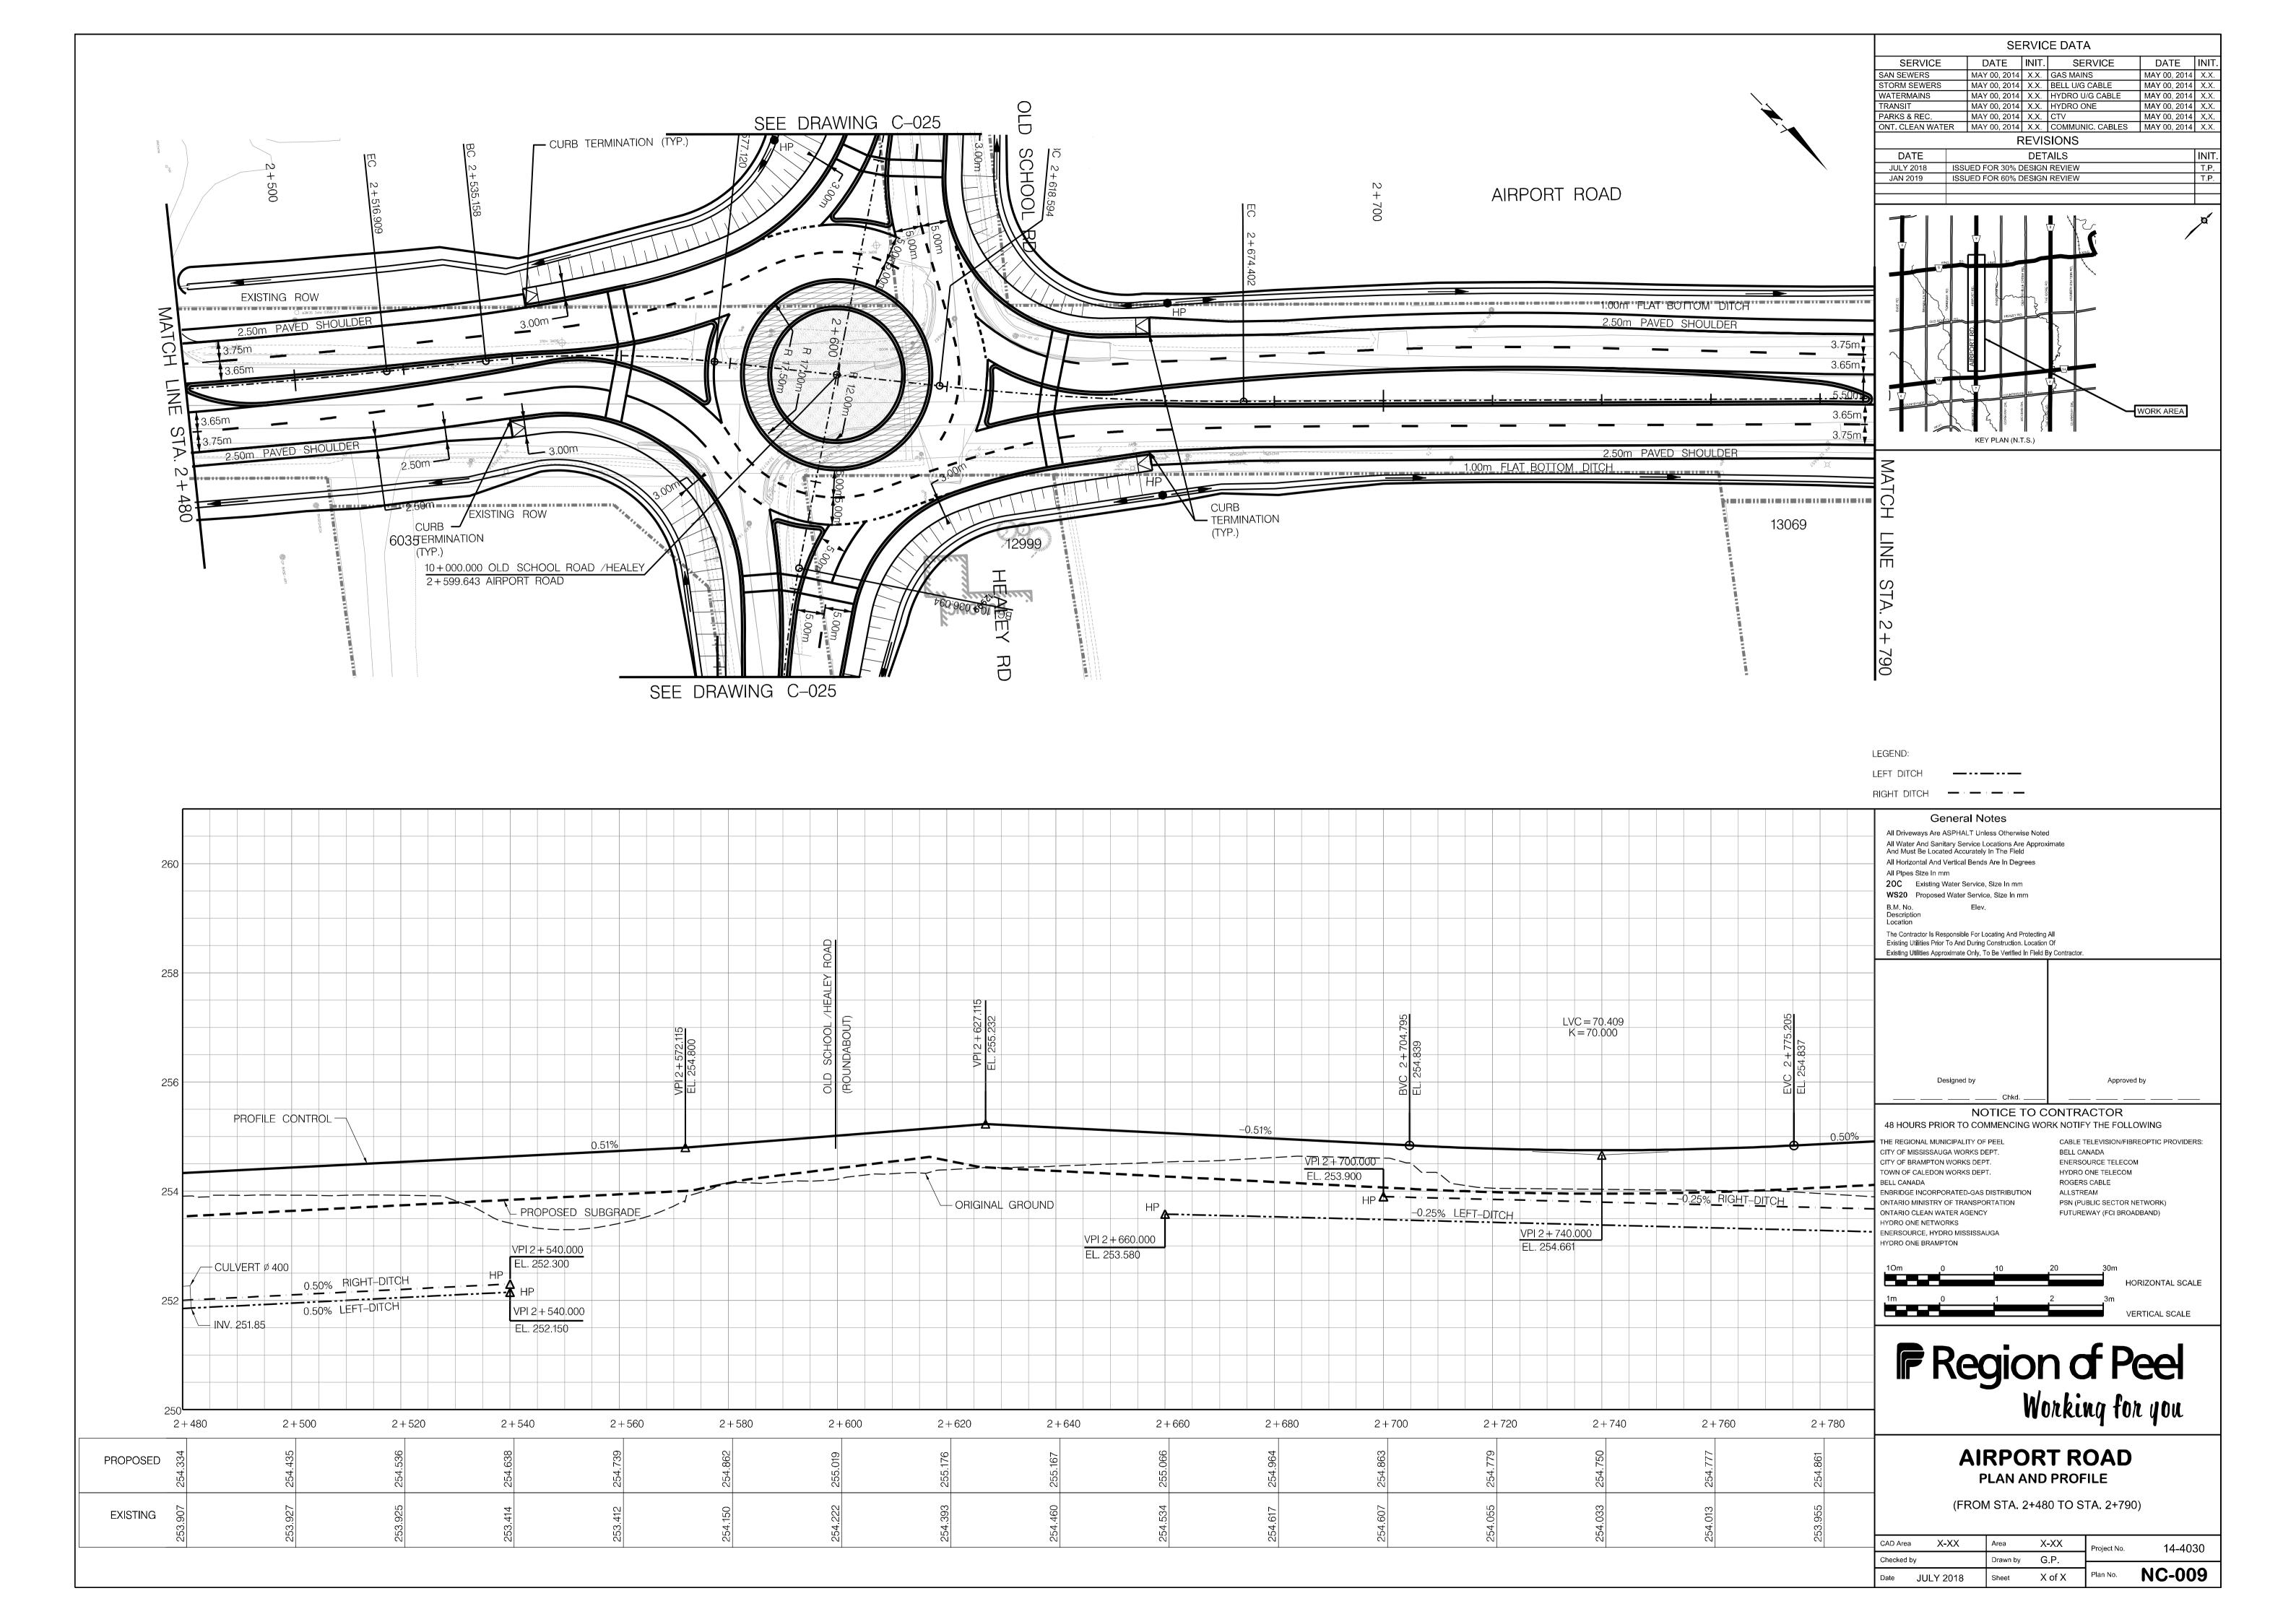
Rural Section - Airport Road 1.0 km north of Mayfield Road to 610m south of King Street (south of Sandhill)
